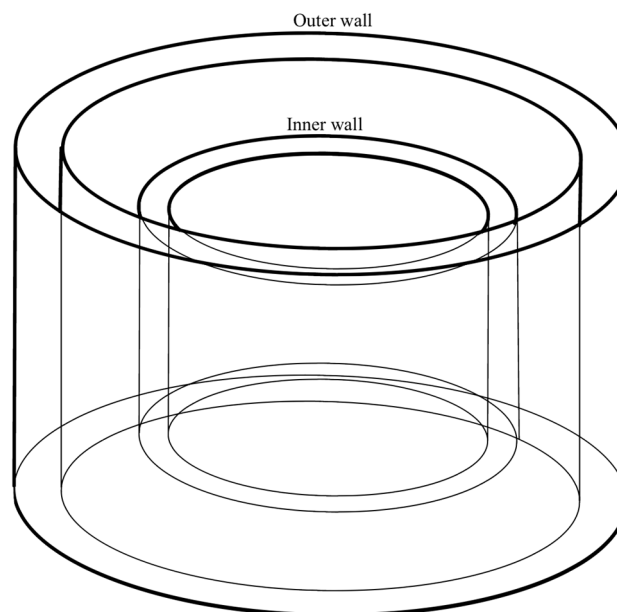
Tank schematics in the case of a single insulation layer and the cylindrical onshore proposed shape (SC 02)
